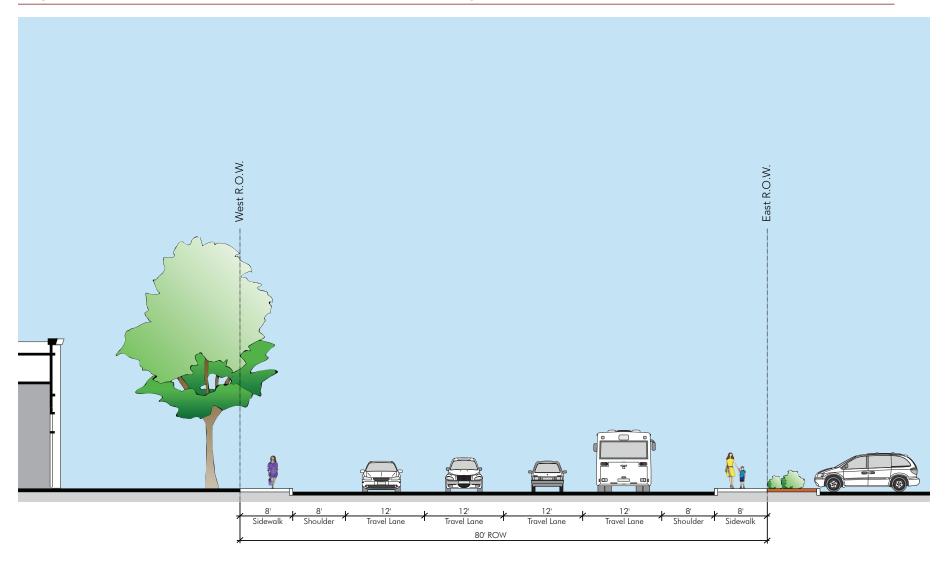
B: Buena Vista Street Proposed Street Section (Northbound View)
